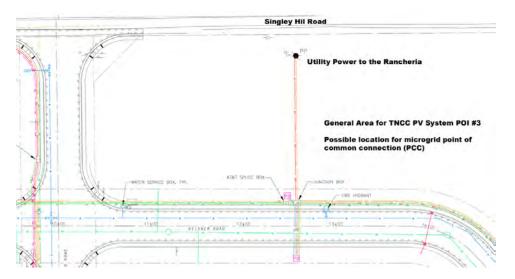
POI #3 for TNCC PV System - section of the Rancheria's Utility Plan
